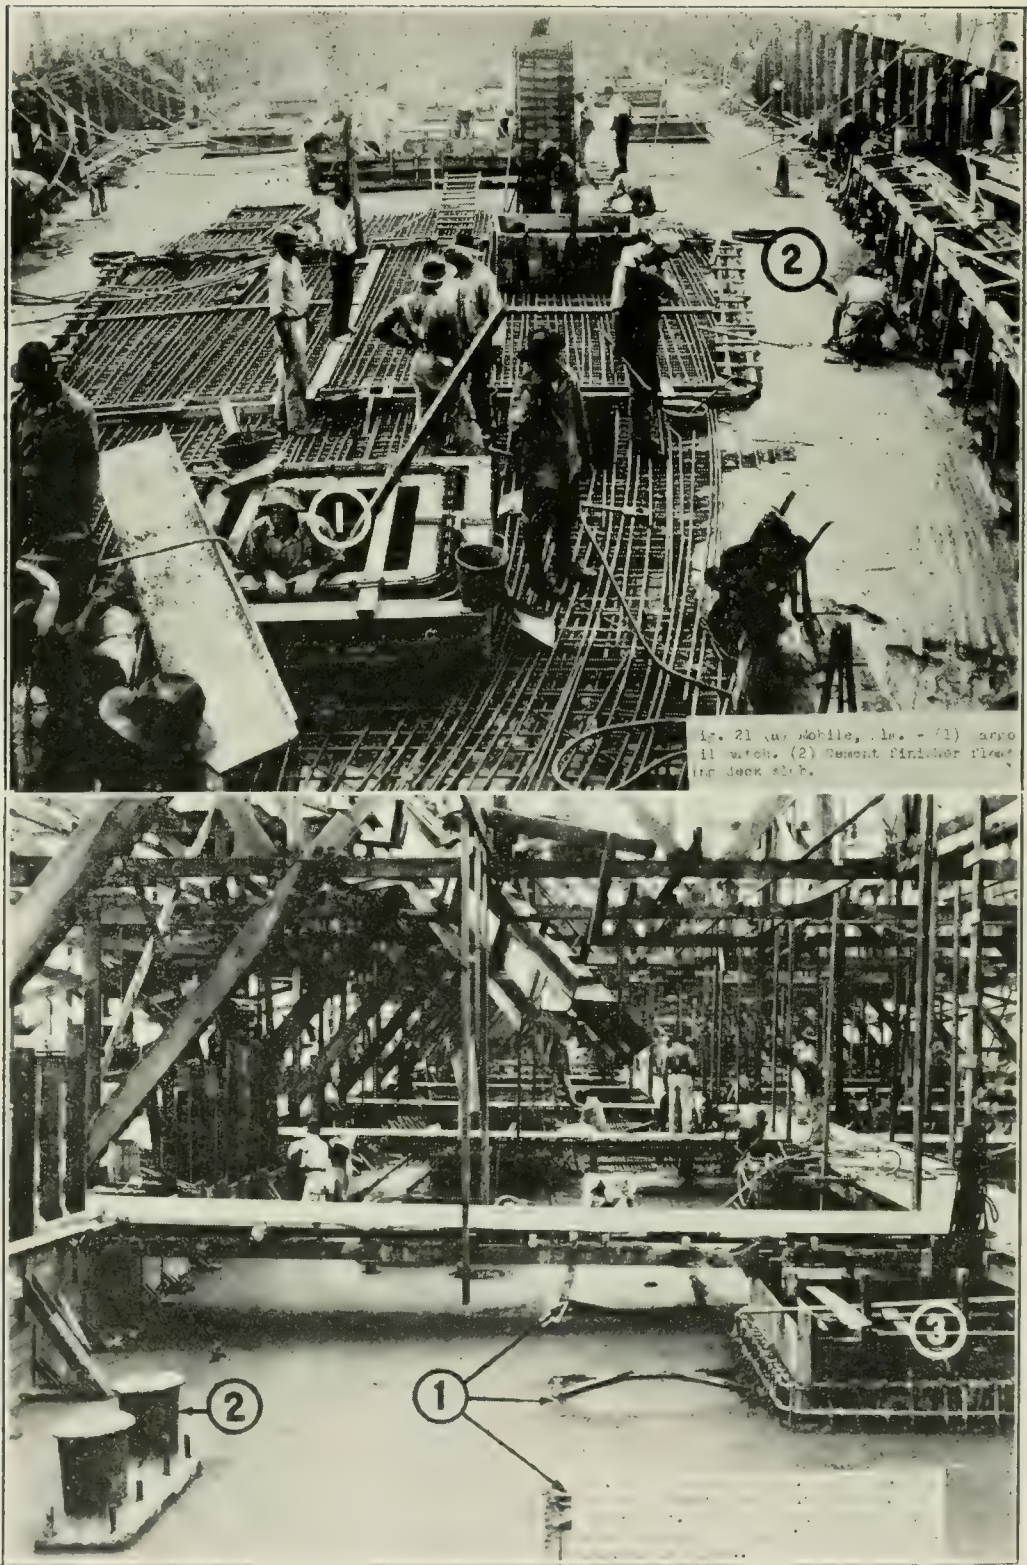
CONCRETE PLACED IN THE TOP DECK FILLET, DECK SLAB AND BEAMS.
